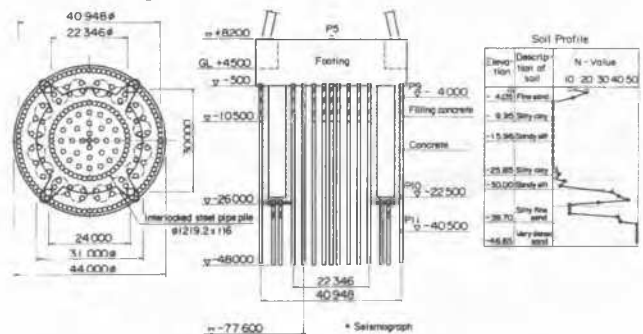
Cross Section of the Double Wall Typed Well Foundation
